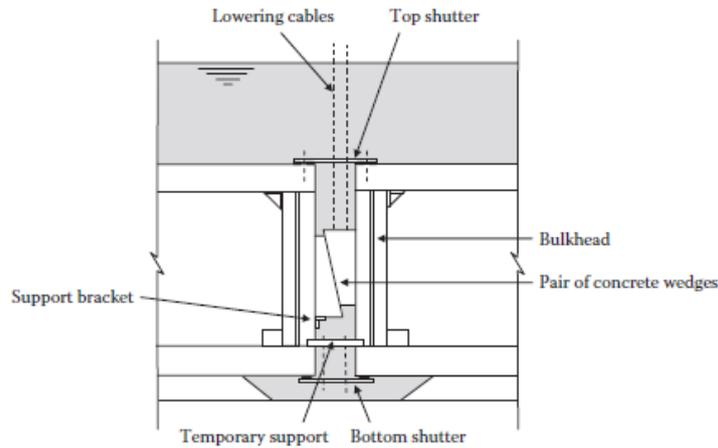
, CONCRETE IN-SITU CLOSURE JOINT (BABER & LUNISS, 2013)
